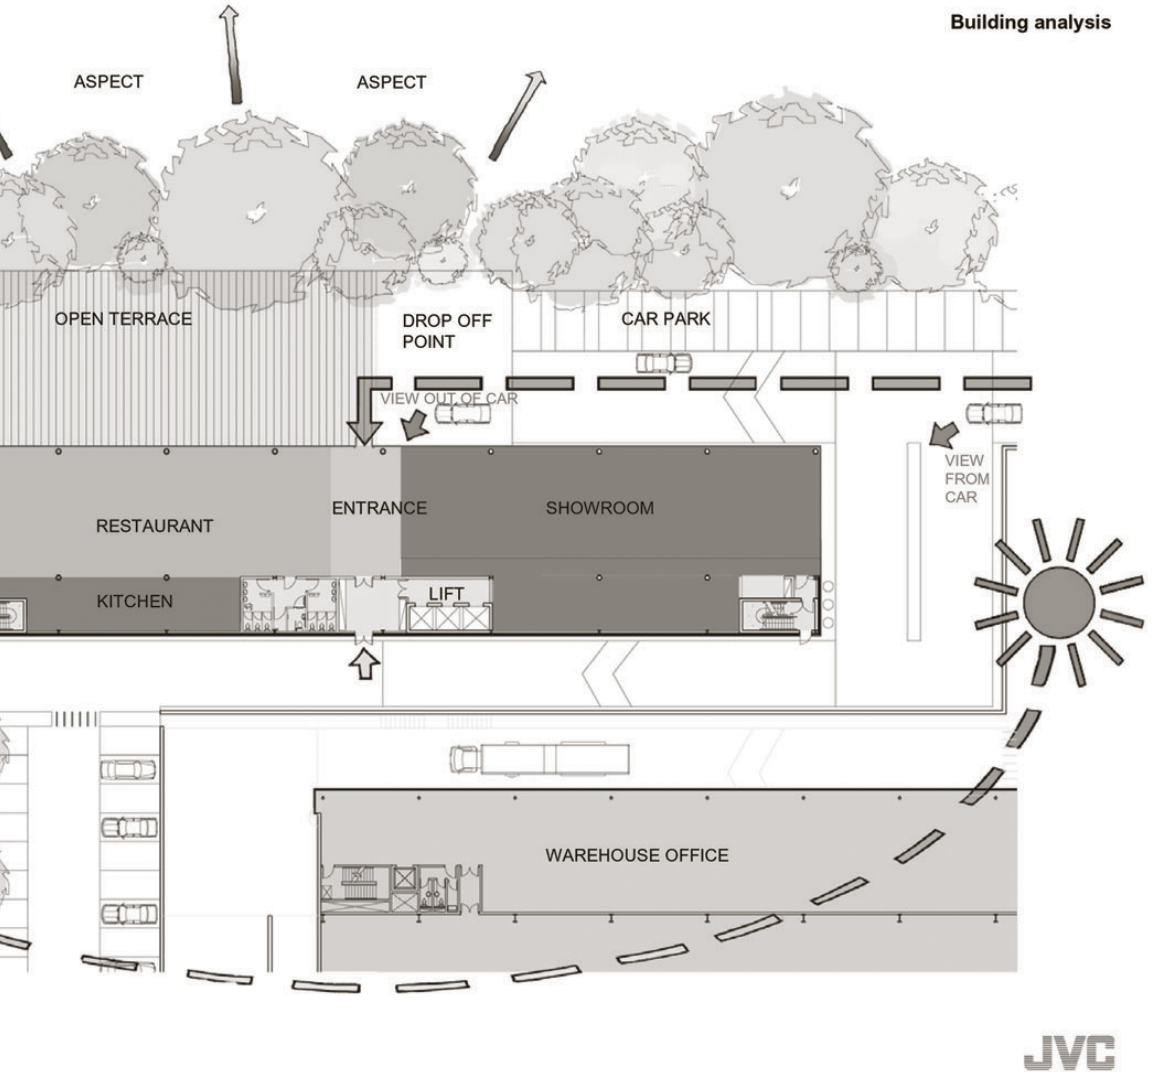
Site Plan: The new JVC headquarters building on the outskirts of London
